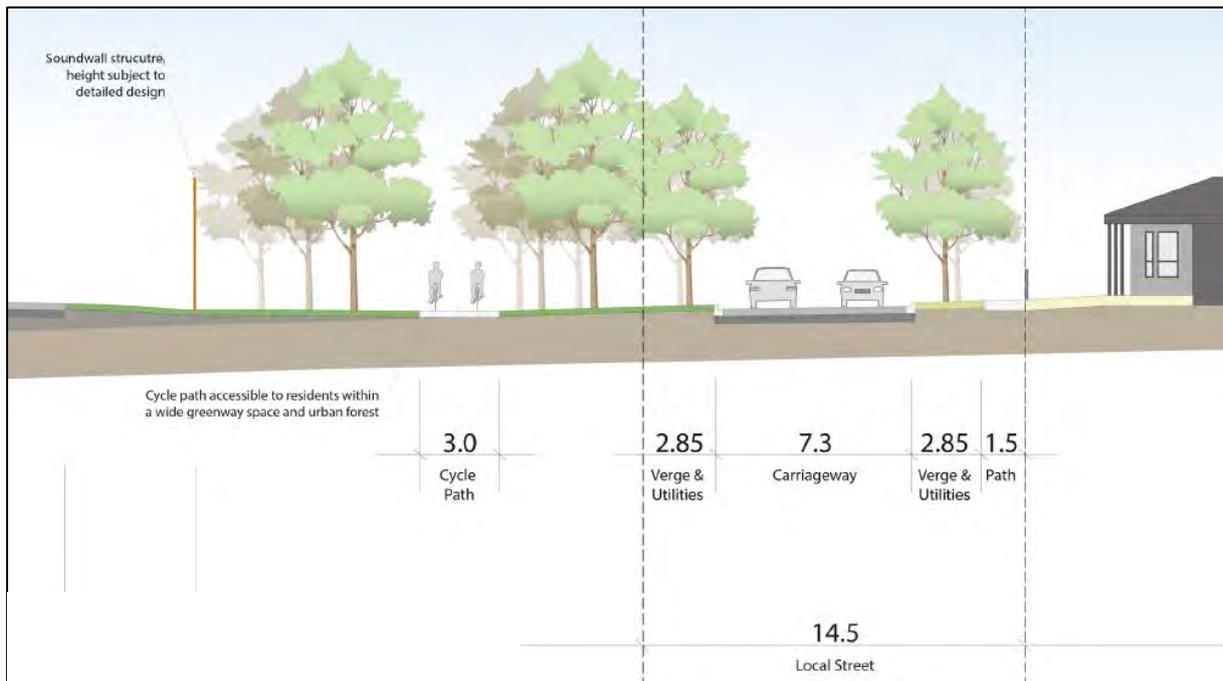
Park Edge and ELR Interface Local Street Cross-Section
